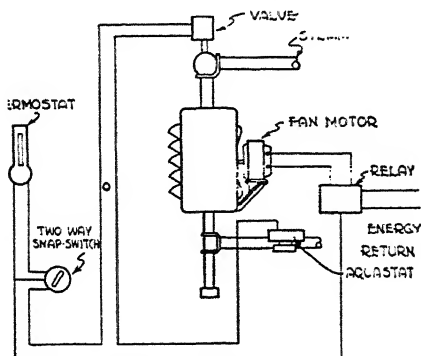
Control Arrangement for a Recirculating Type Unit Heater
